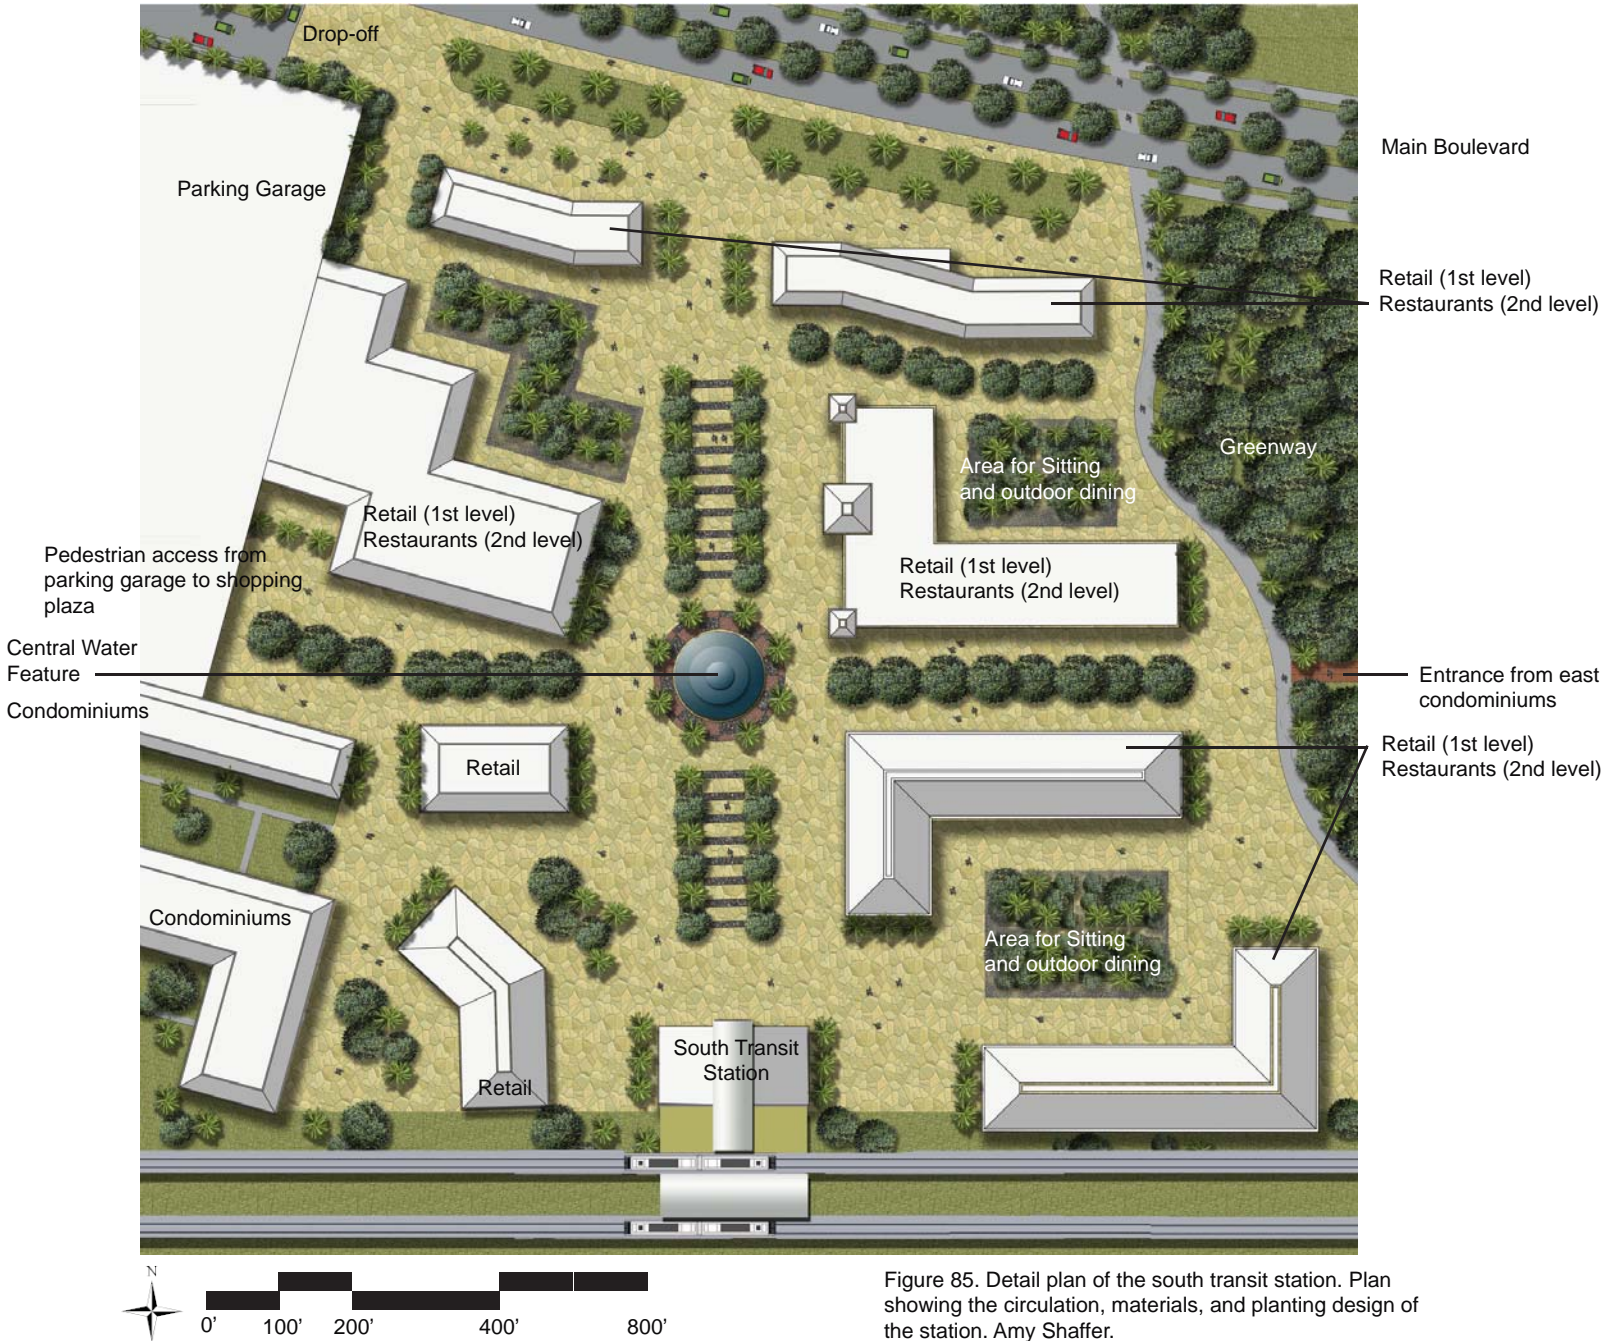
Detail plan of the south transit station. Plan showing the circulation, materials, and planting design of the station. Amy Shaffer.
